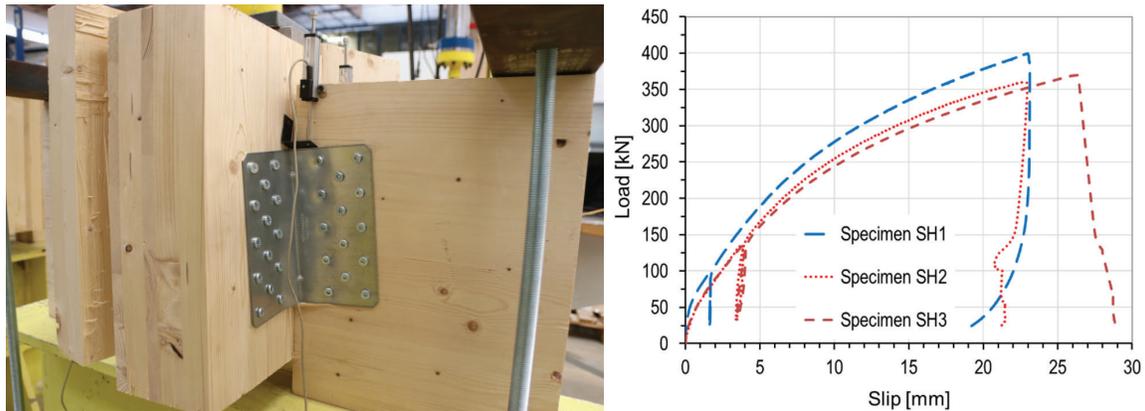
Typical failure of the test specimen with a shear bracket (left), panel-to-panel slip vs. load of the test specimen (entire specimen with four brackets, right).
